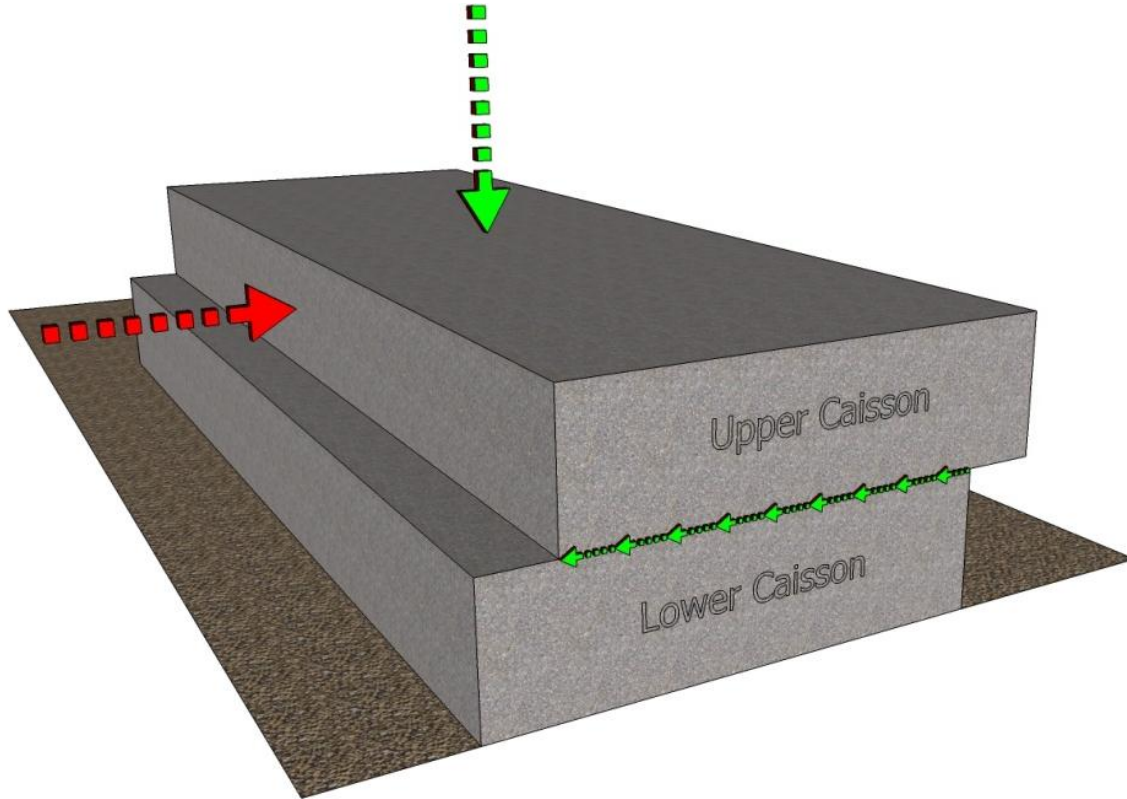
illustration failure mechanism, horizontal sliding of upper caisson
